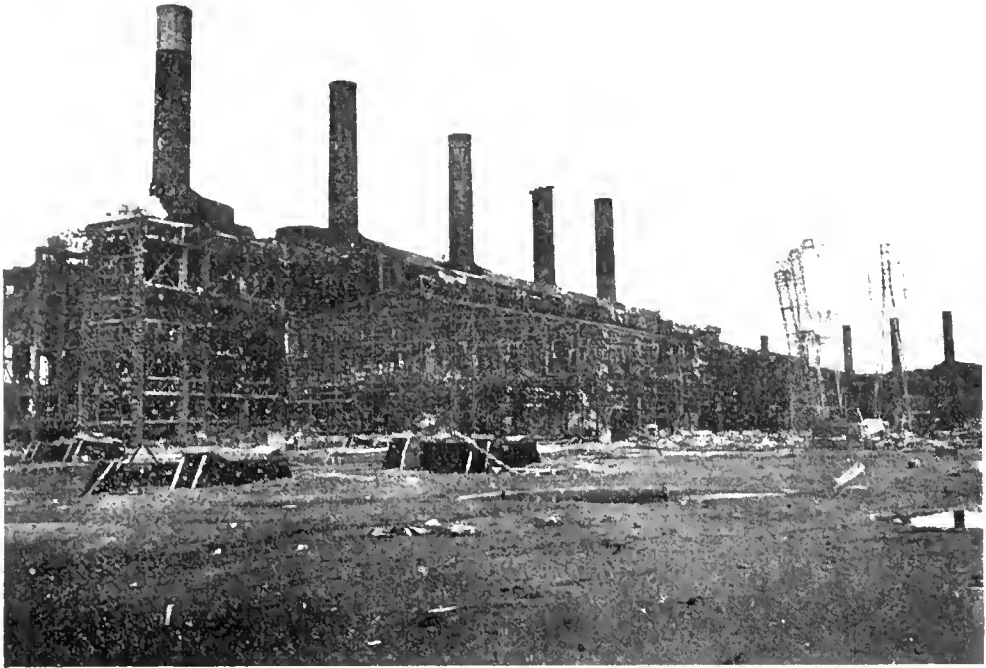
General view of plant looking north with part of building and stacks of Amagasaki in background at right
